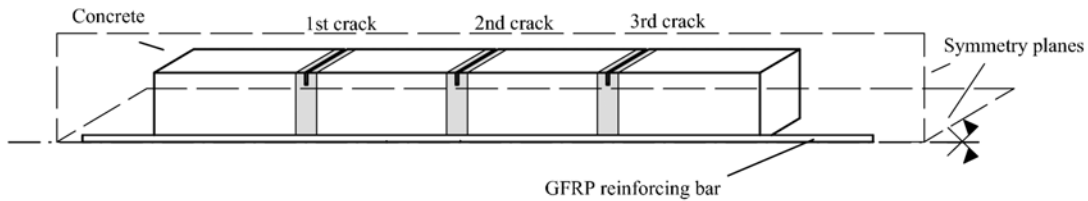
Concrete tie model for specimen 16\_170\_3N.
